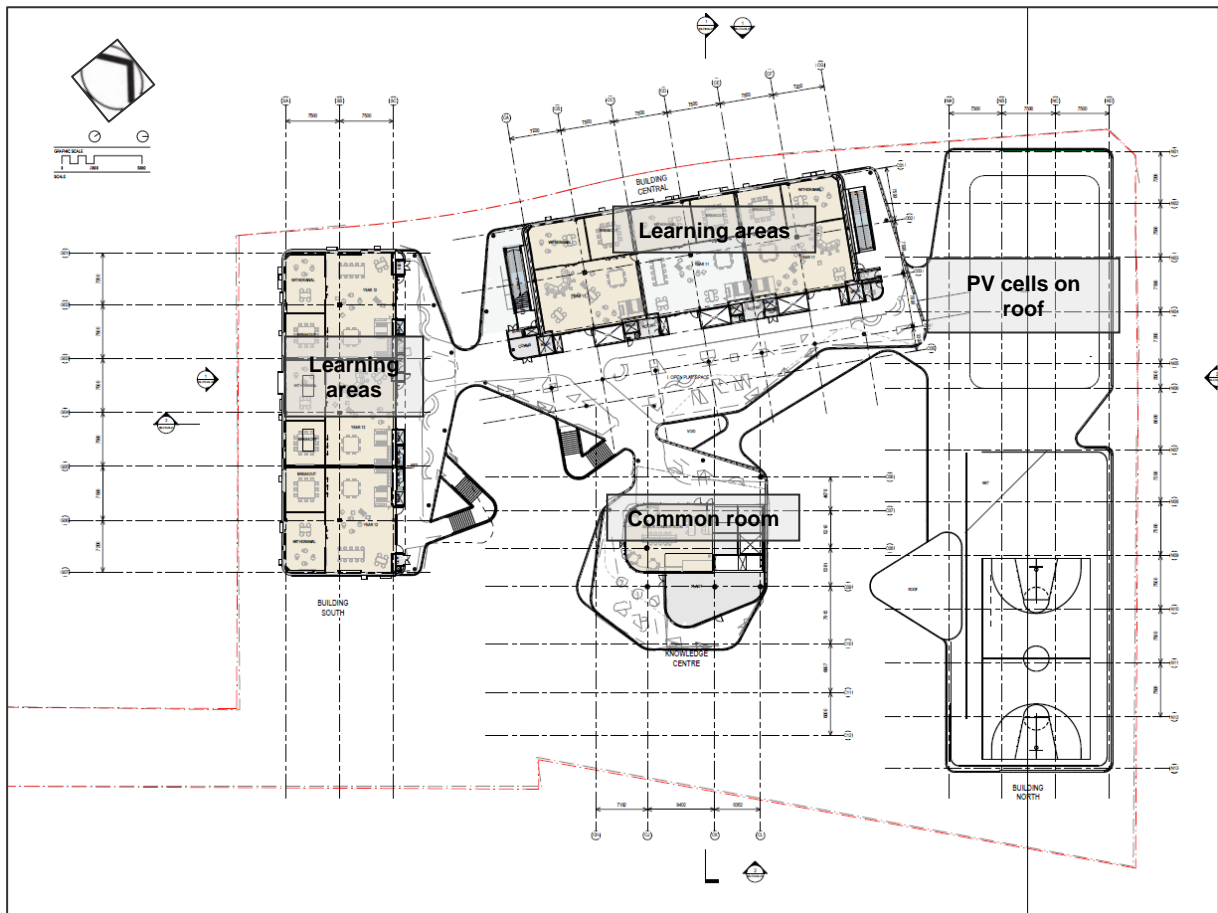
| Proposed Level 5 (Source: Applicant's SRtS)
